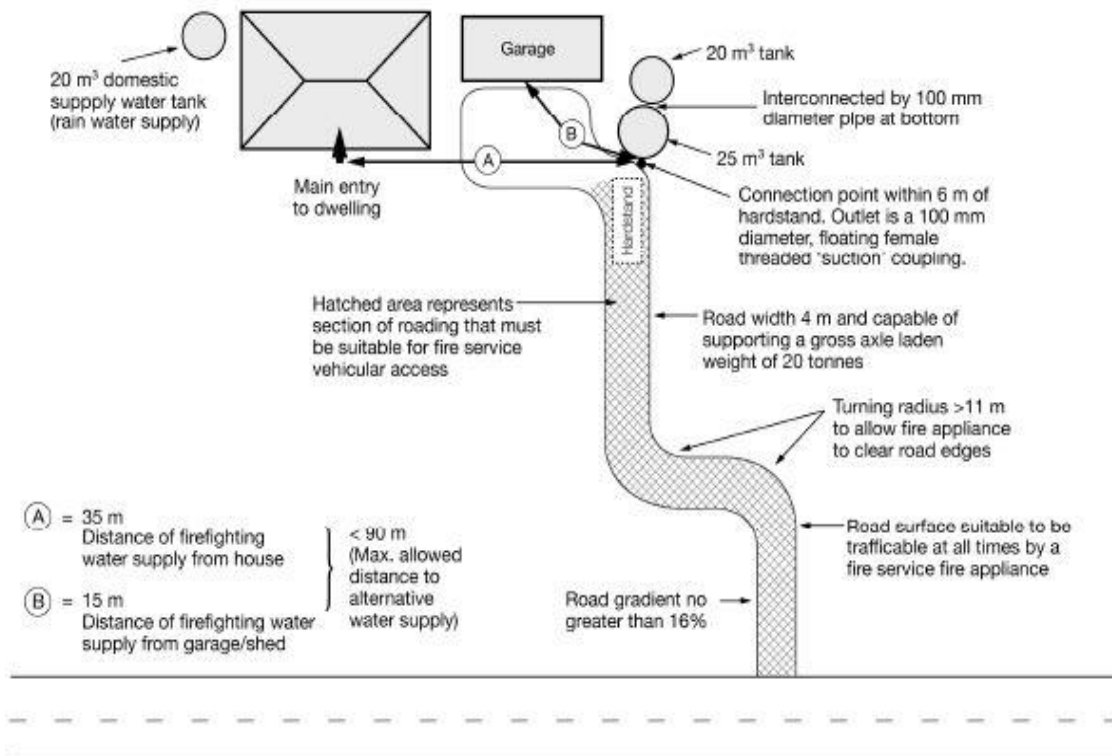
Firefighting water supply requirements for an unsprinklered house with no access to a reticulated water supply
